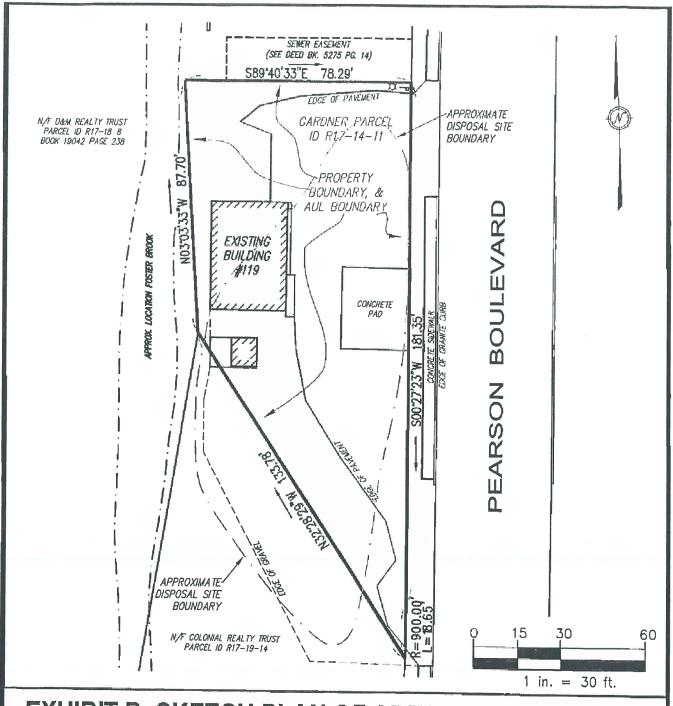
EXHIBIT B, SKETCH PLAN OF AREA SUBJECT TO AUL
